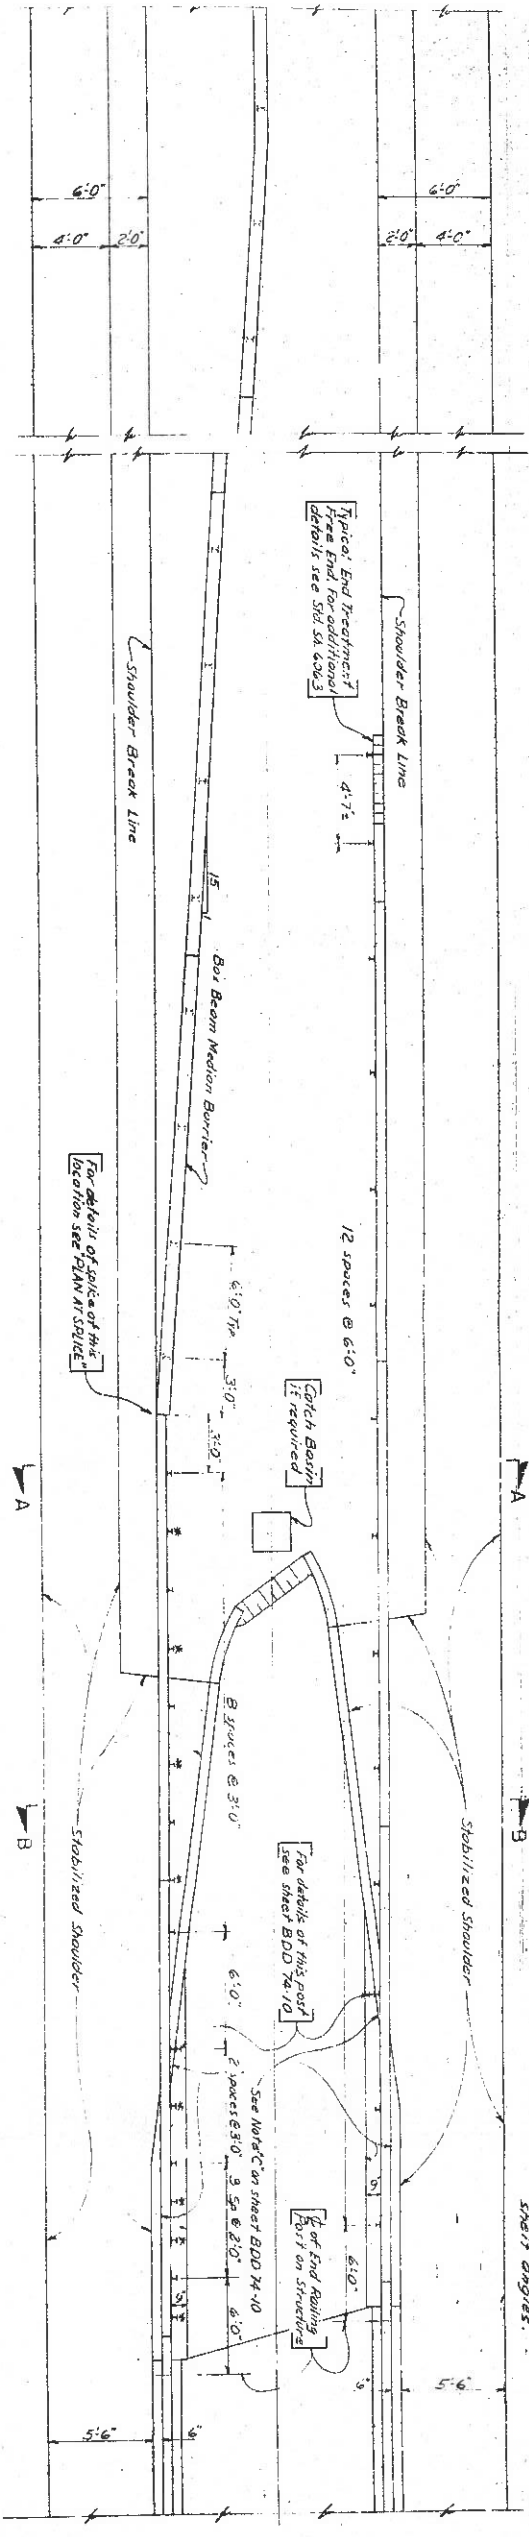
DETAIL OF CURB CONCRETE BACKING - TYPE II SHOULDER
